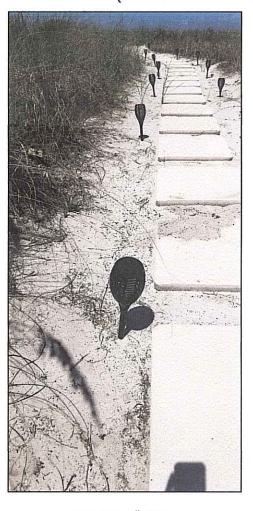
SIGN (SEE SHEET 2 OF 7)
